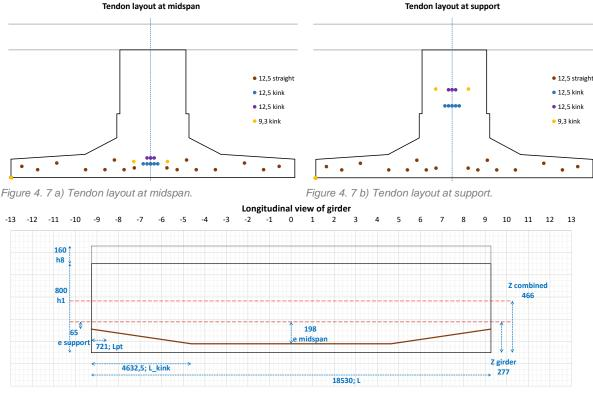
7 c) Longitudinal view of simplified prestressing layout, all strands are replaced by one equivalent tendon. Schematisation of prestressing force
